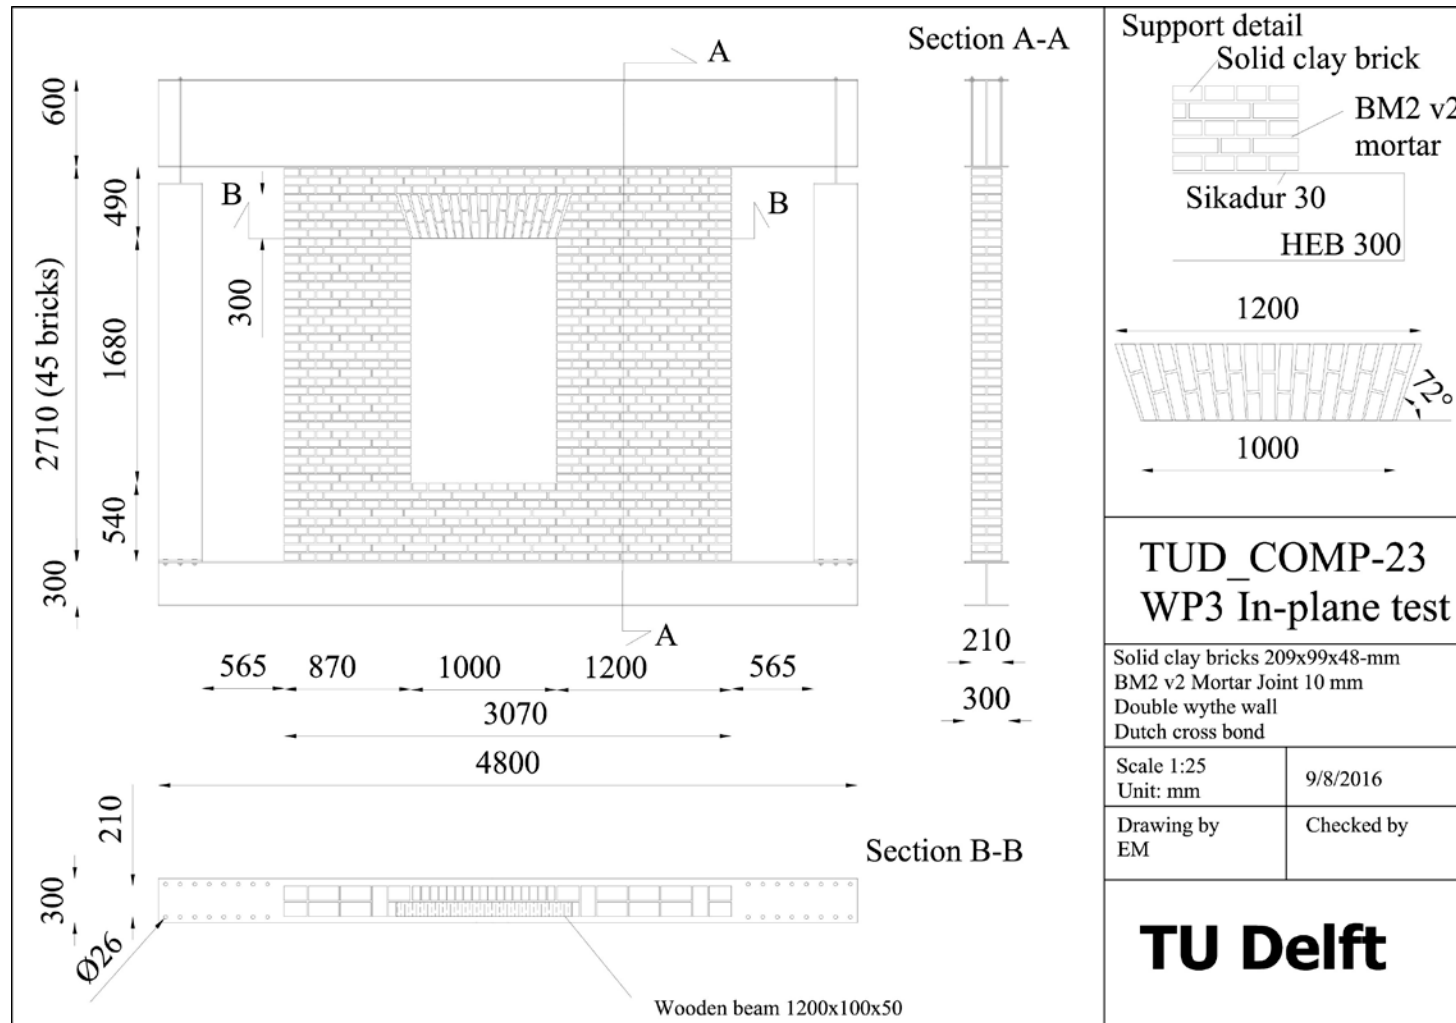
Drawing adopted for the construction of wall TUD_COMP-23. As built dimension in Table 19.
